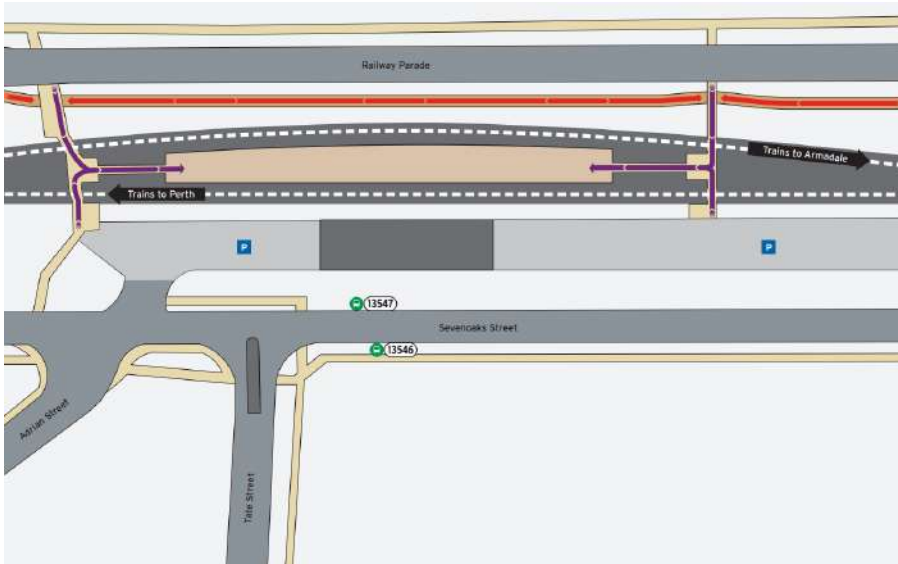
QUEENS PARK STATION EXISTING LAYOUT
